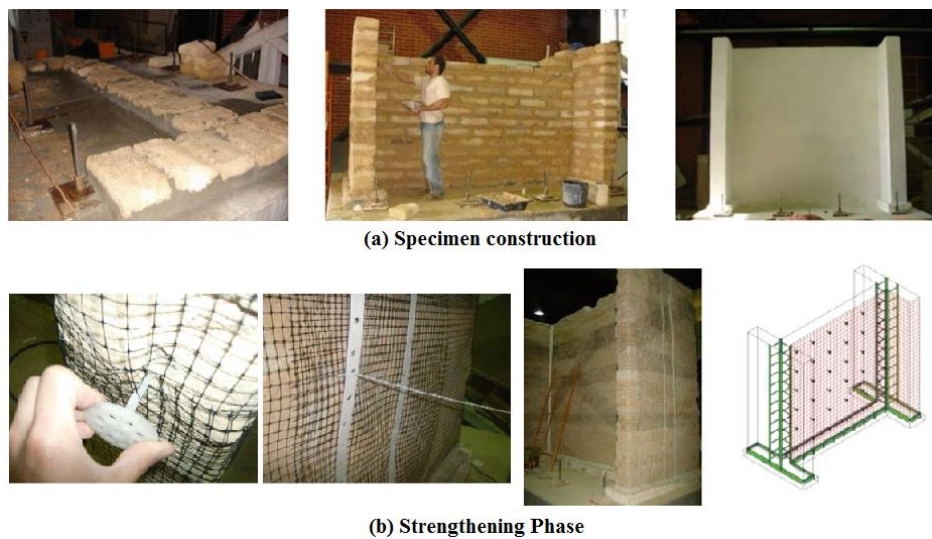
Construction and strengthening of an adobe masonry wall in Aveiro University (Figueiredo *et al.*, 2013)
